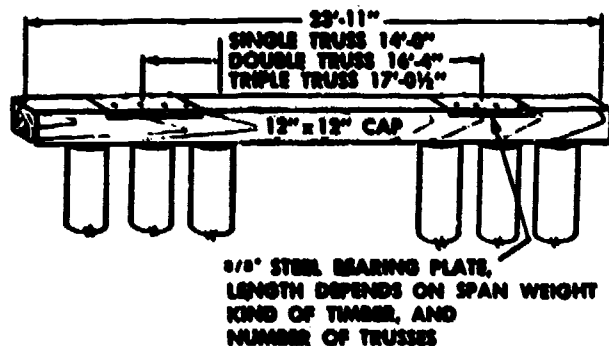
Construction of pile caps for intermediate supports under panel bridges without end posts or bearings. Cap of single timber or pile bent. Steel bearing plates provide seating for each line of trusses.
